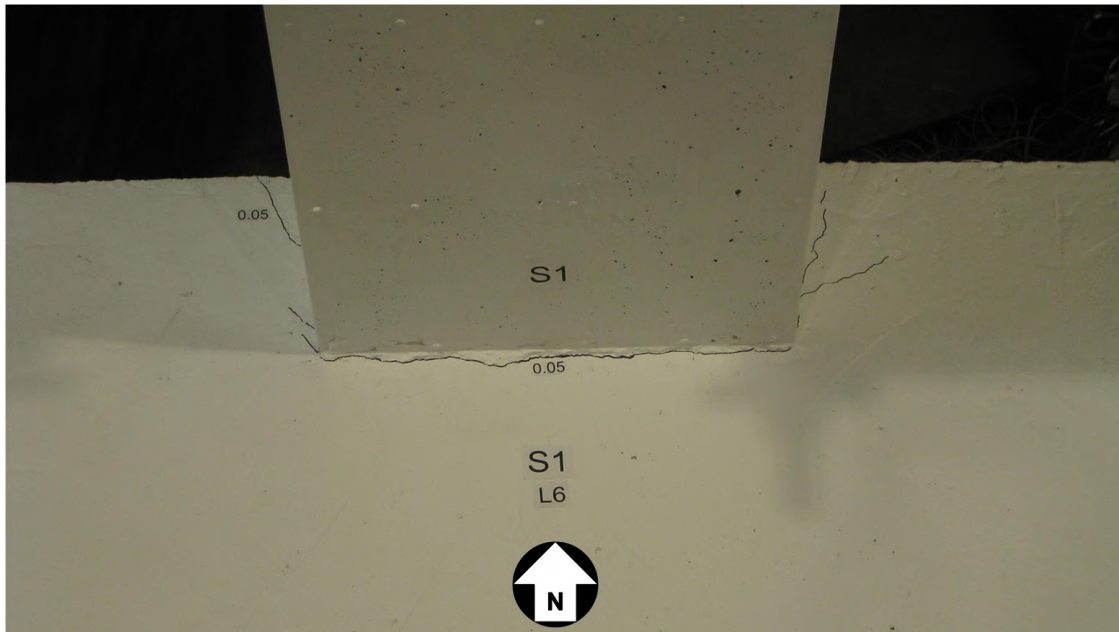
Specimen 1 slab cracks at $V = 73.6$ kN
